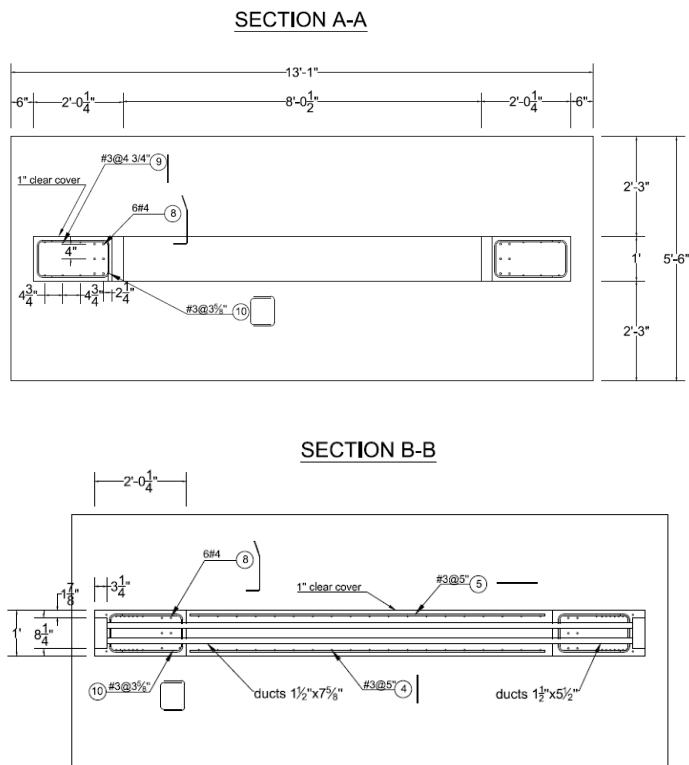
Sections A-A and B-B in design drawings in Figure 7.2
